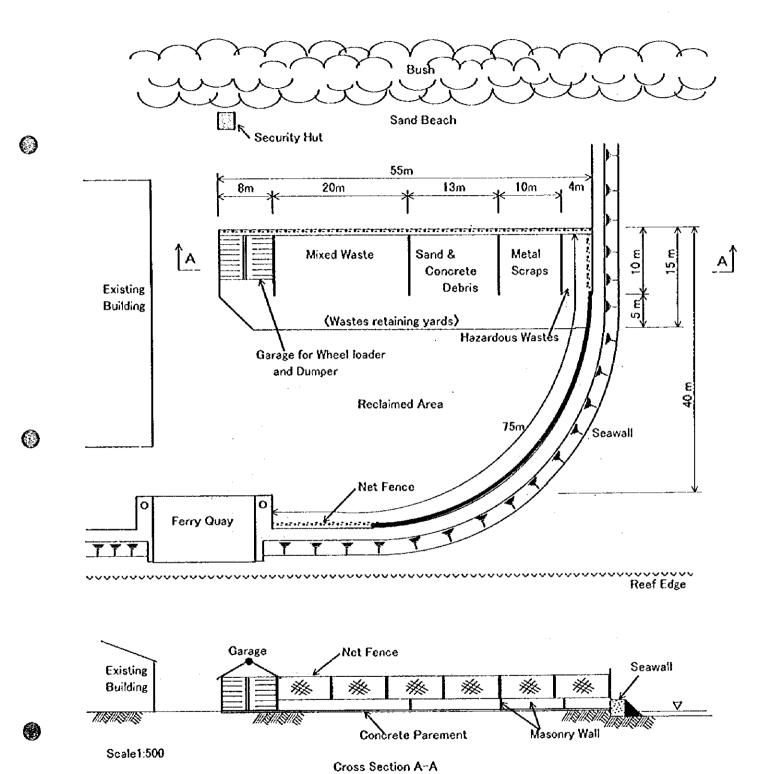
Improvement Plan of Deposit Site (Villingili)
